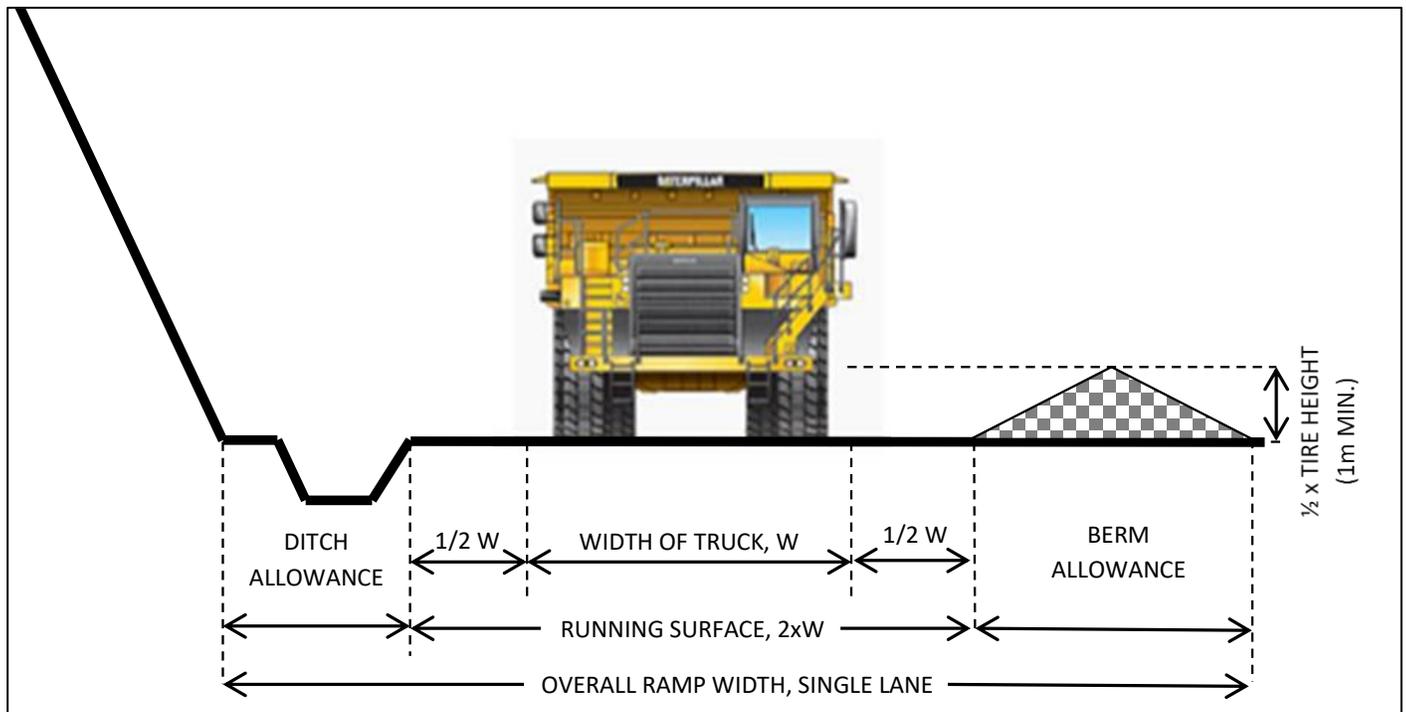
and Figure 16-5 illustrate the typical haul ramp profile. Table 16-7 summarizes the haul ramp width calculation that has been used in the pit and phase designs. The widest truck of that class was used for the ramp width calculation for flexibility in the future.
